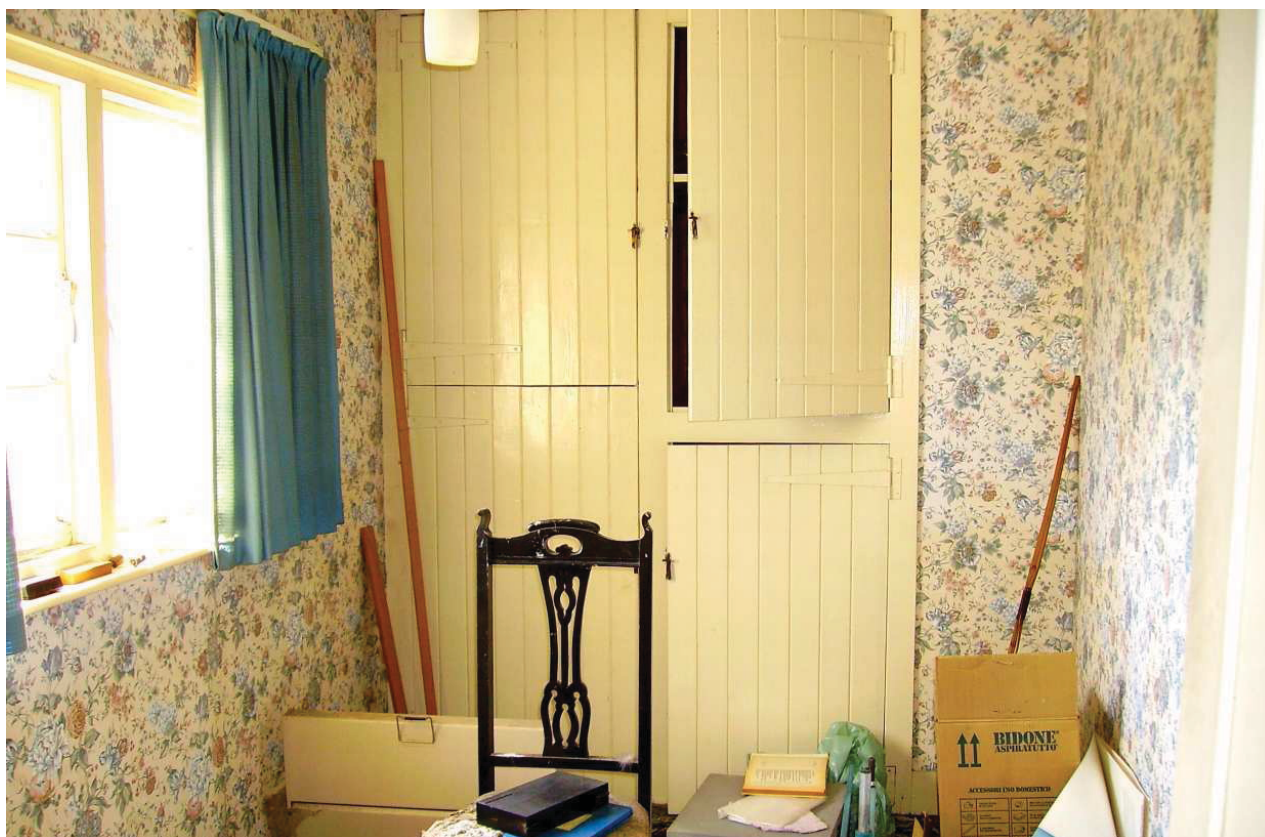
Interior. Building 1, room 14, bedroom east elevation
